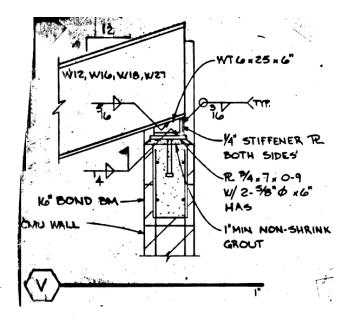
Structural drawing of roof girder-to-CMU wall detail that failed (courtesy MSBSD). Postearthquake inspections revealed that the bond beam at the top of the CMU wall had not been installed.
